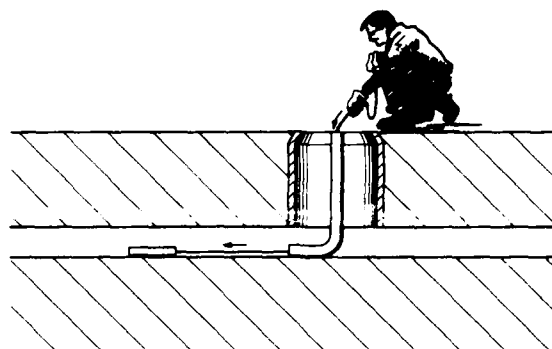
Pushing a sewer snake with attached probe through a pipe with a 90° bend helps to move the probe horizontally in a dry line.
